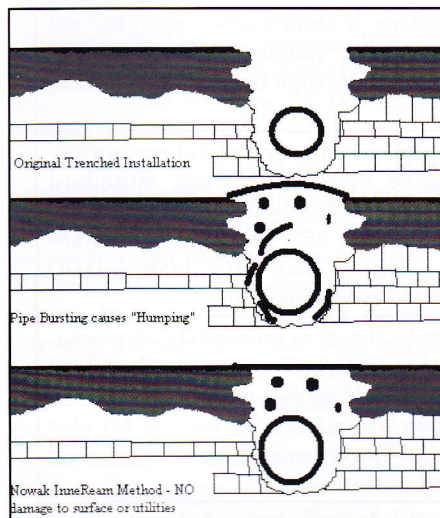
Advantage of the Nowak InneReam™ method of pipe reaming over bursting in a shallow rock trench original excavation.
